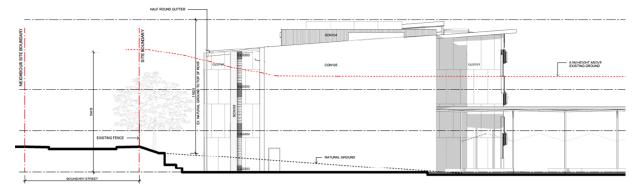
Building N – East Elevation (Source: NBRS Architecture, Dated 26/02/2019)
